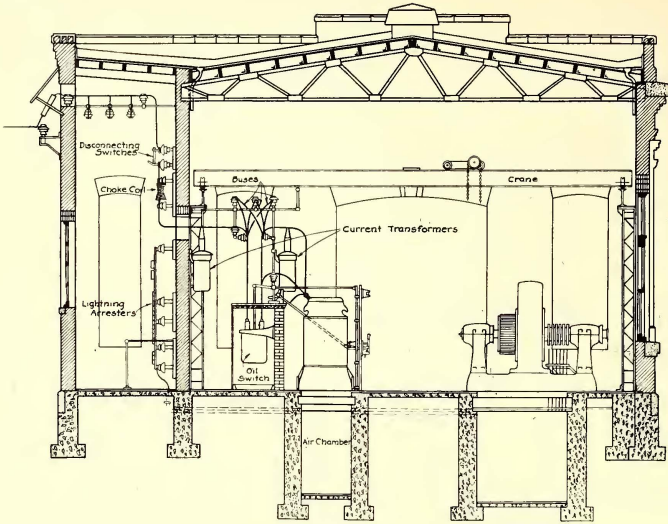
TRANSVERSE SECTION OF TYPICAL SUB-STATION
